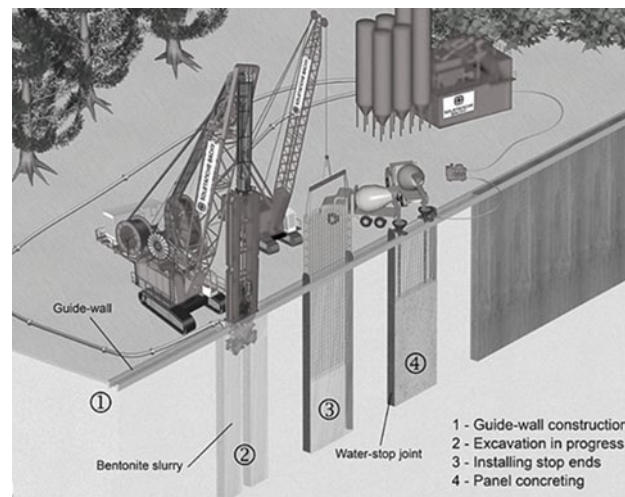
The scheme of stages of works at construction of a diaphragm wall.
